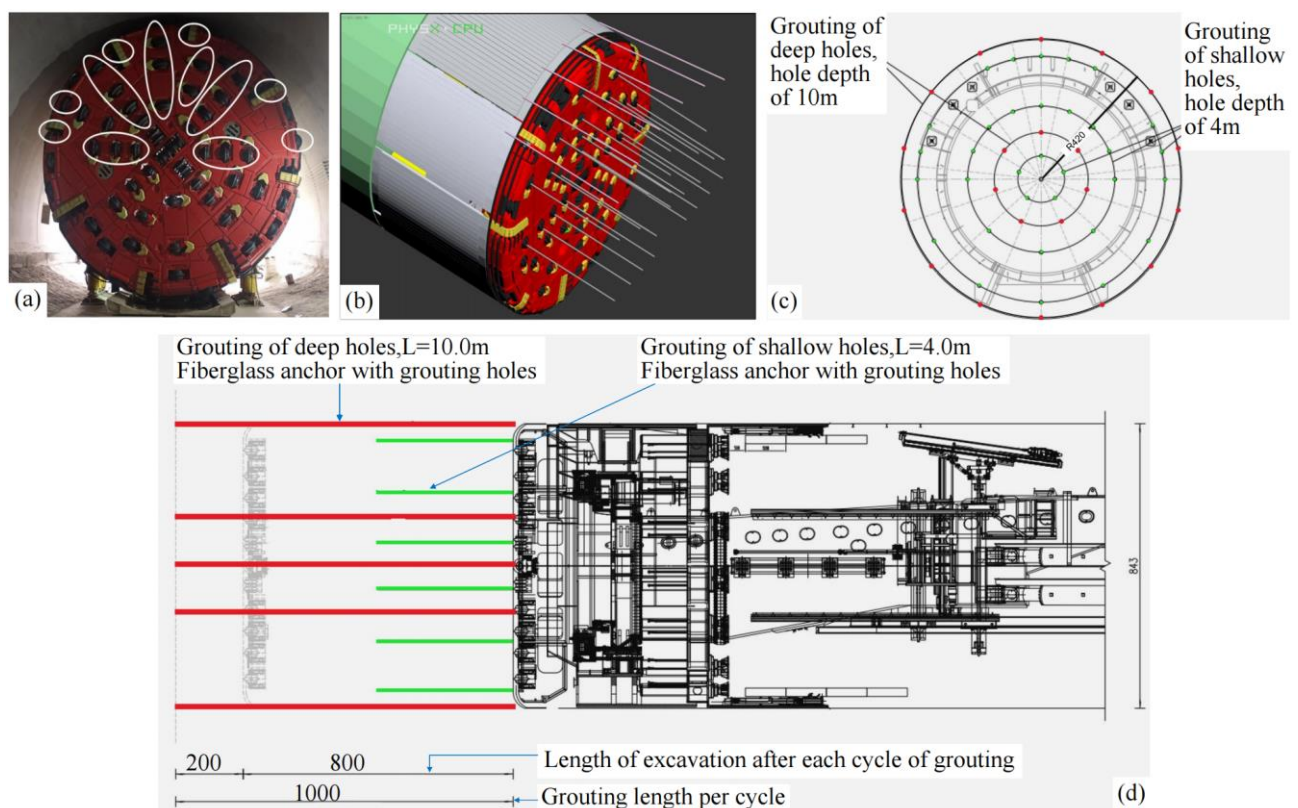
(a)(b) - Schematic diagram of grouting on tunnel face;(c), (d) design drawing of overtopping grouting on tunnel face
